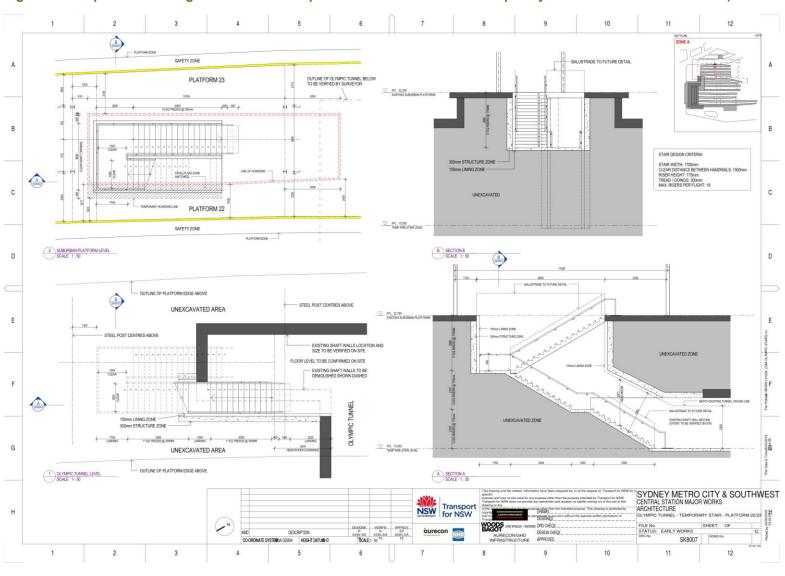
Proposed hoarding and initial 2m deep excavation for the future temporary staircase on Platform 22/23 (Source: Laing O'Rourke, 2018).
